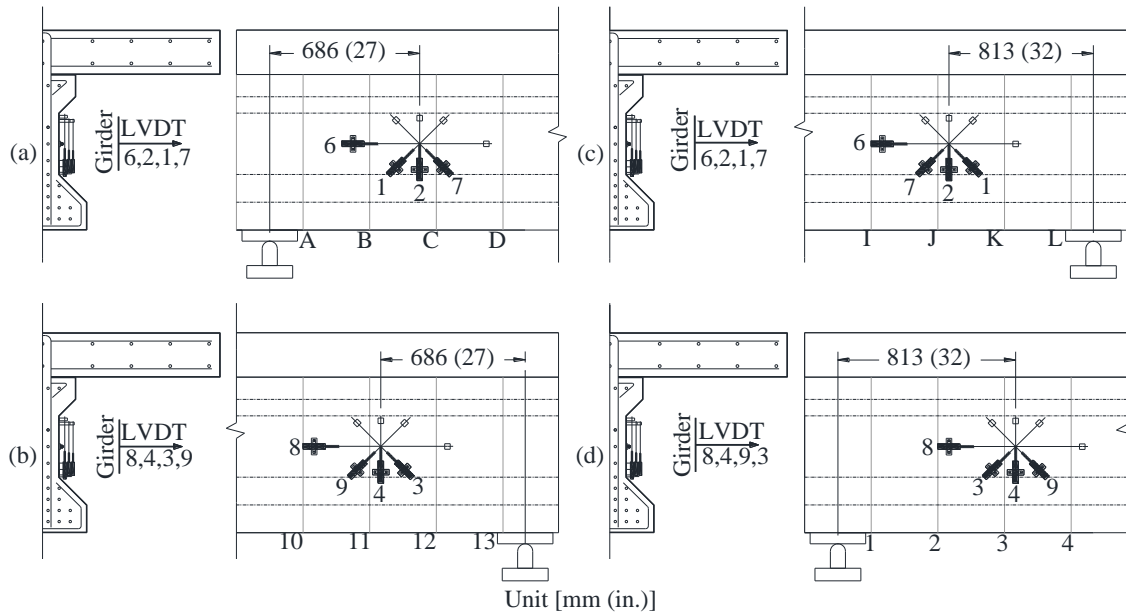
LVDT Layout: (a and b) Shear Test 1 and (c and d) Shear Test 2.
